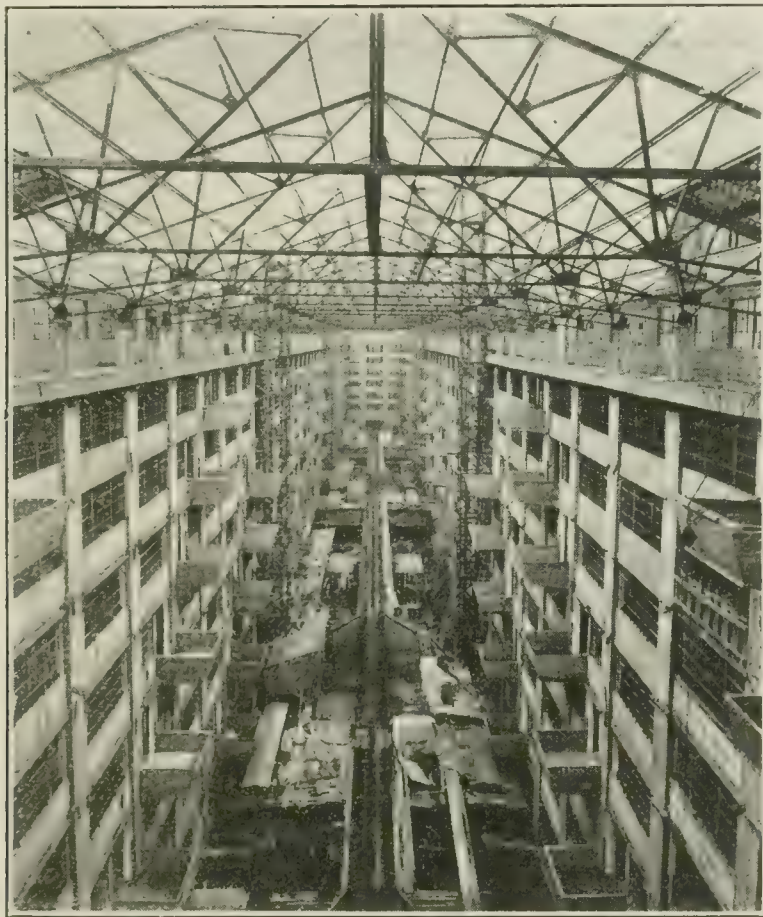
VIEW OF COURT, BUILDING B, SHOWING TRESTLE, BALCONIES AND SKYLIGHT.
